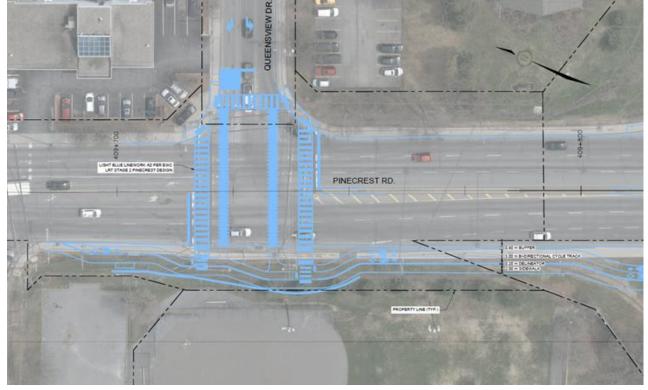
Planned Modifications to Pinecrest Road/Queensview Drive
